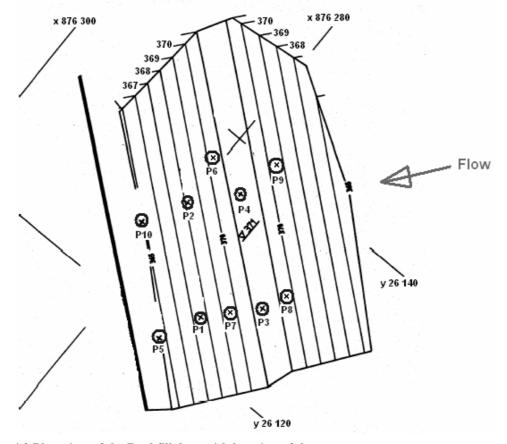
Plan view of the Rockfill dam with location of the pore pressure sensors.
